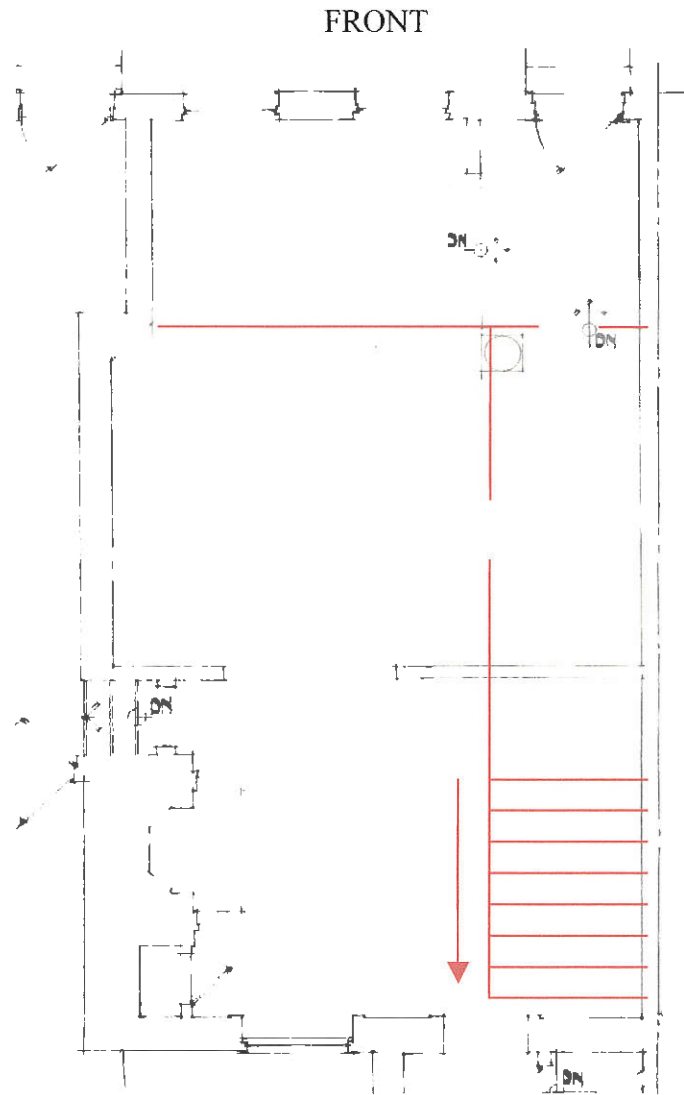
, The first floor of the Adam Barr House. The heavy black lines indicate the house's early nineteenth century dimensions and likely floor plan.
